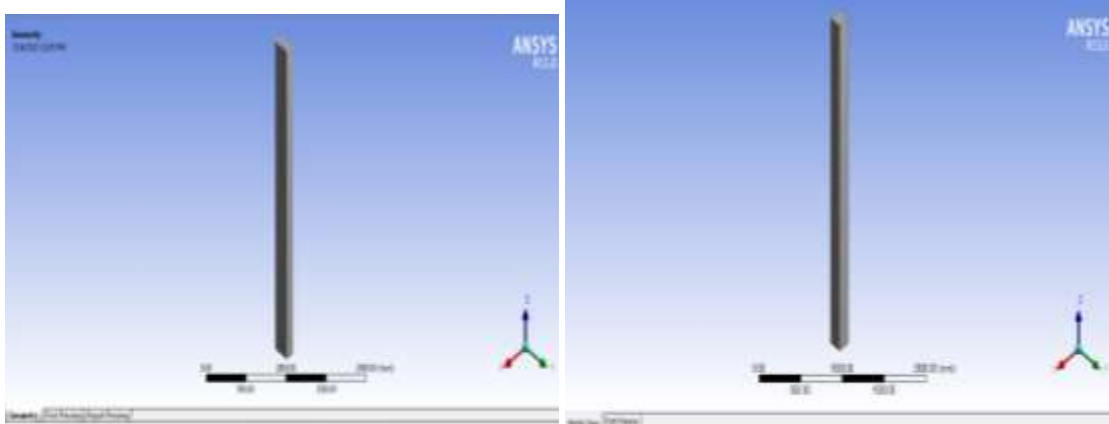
Geometry of Rectangular control and FRP jacketed RC column.
